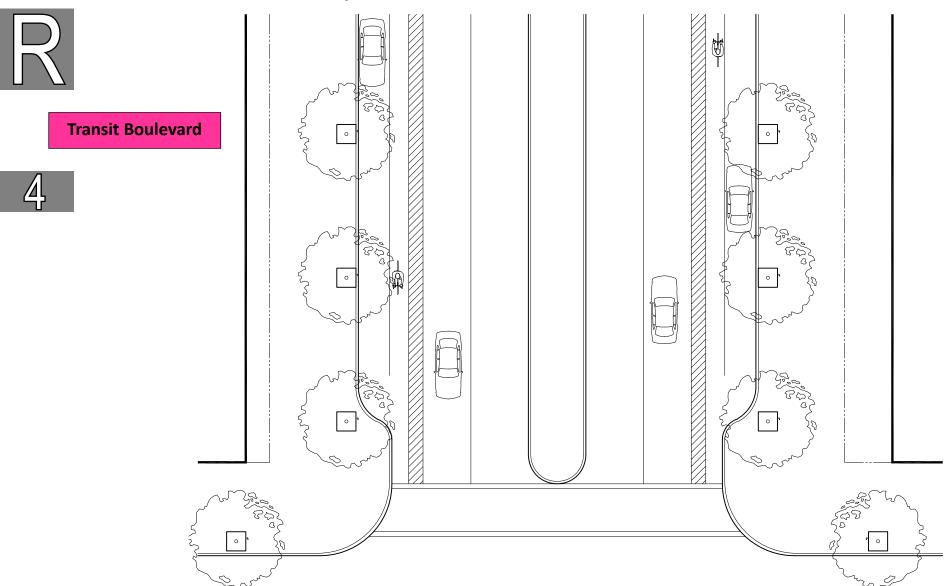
Street Type 5: Typical Intersection (Plan Perspective)
